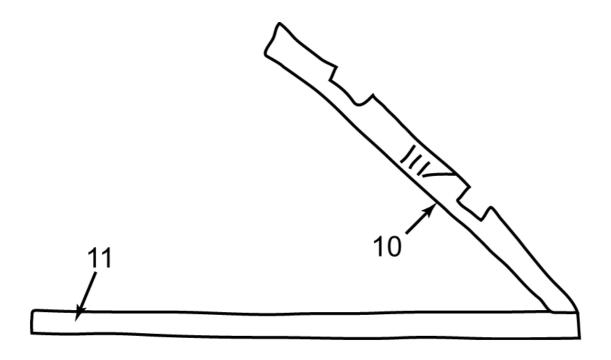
Sketch of truss 3, viewed looking north, showing sample locations
